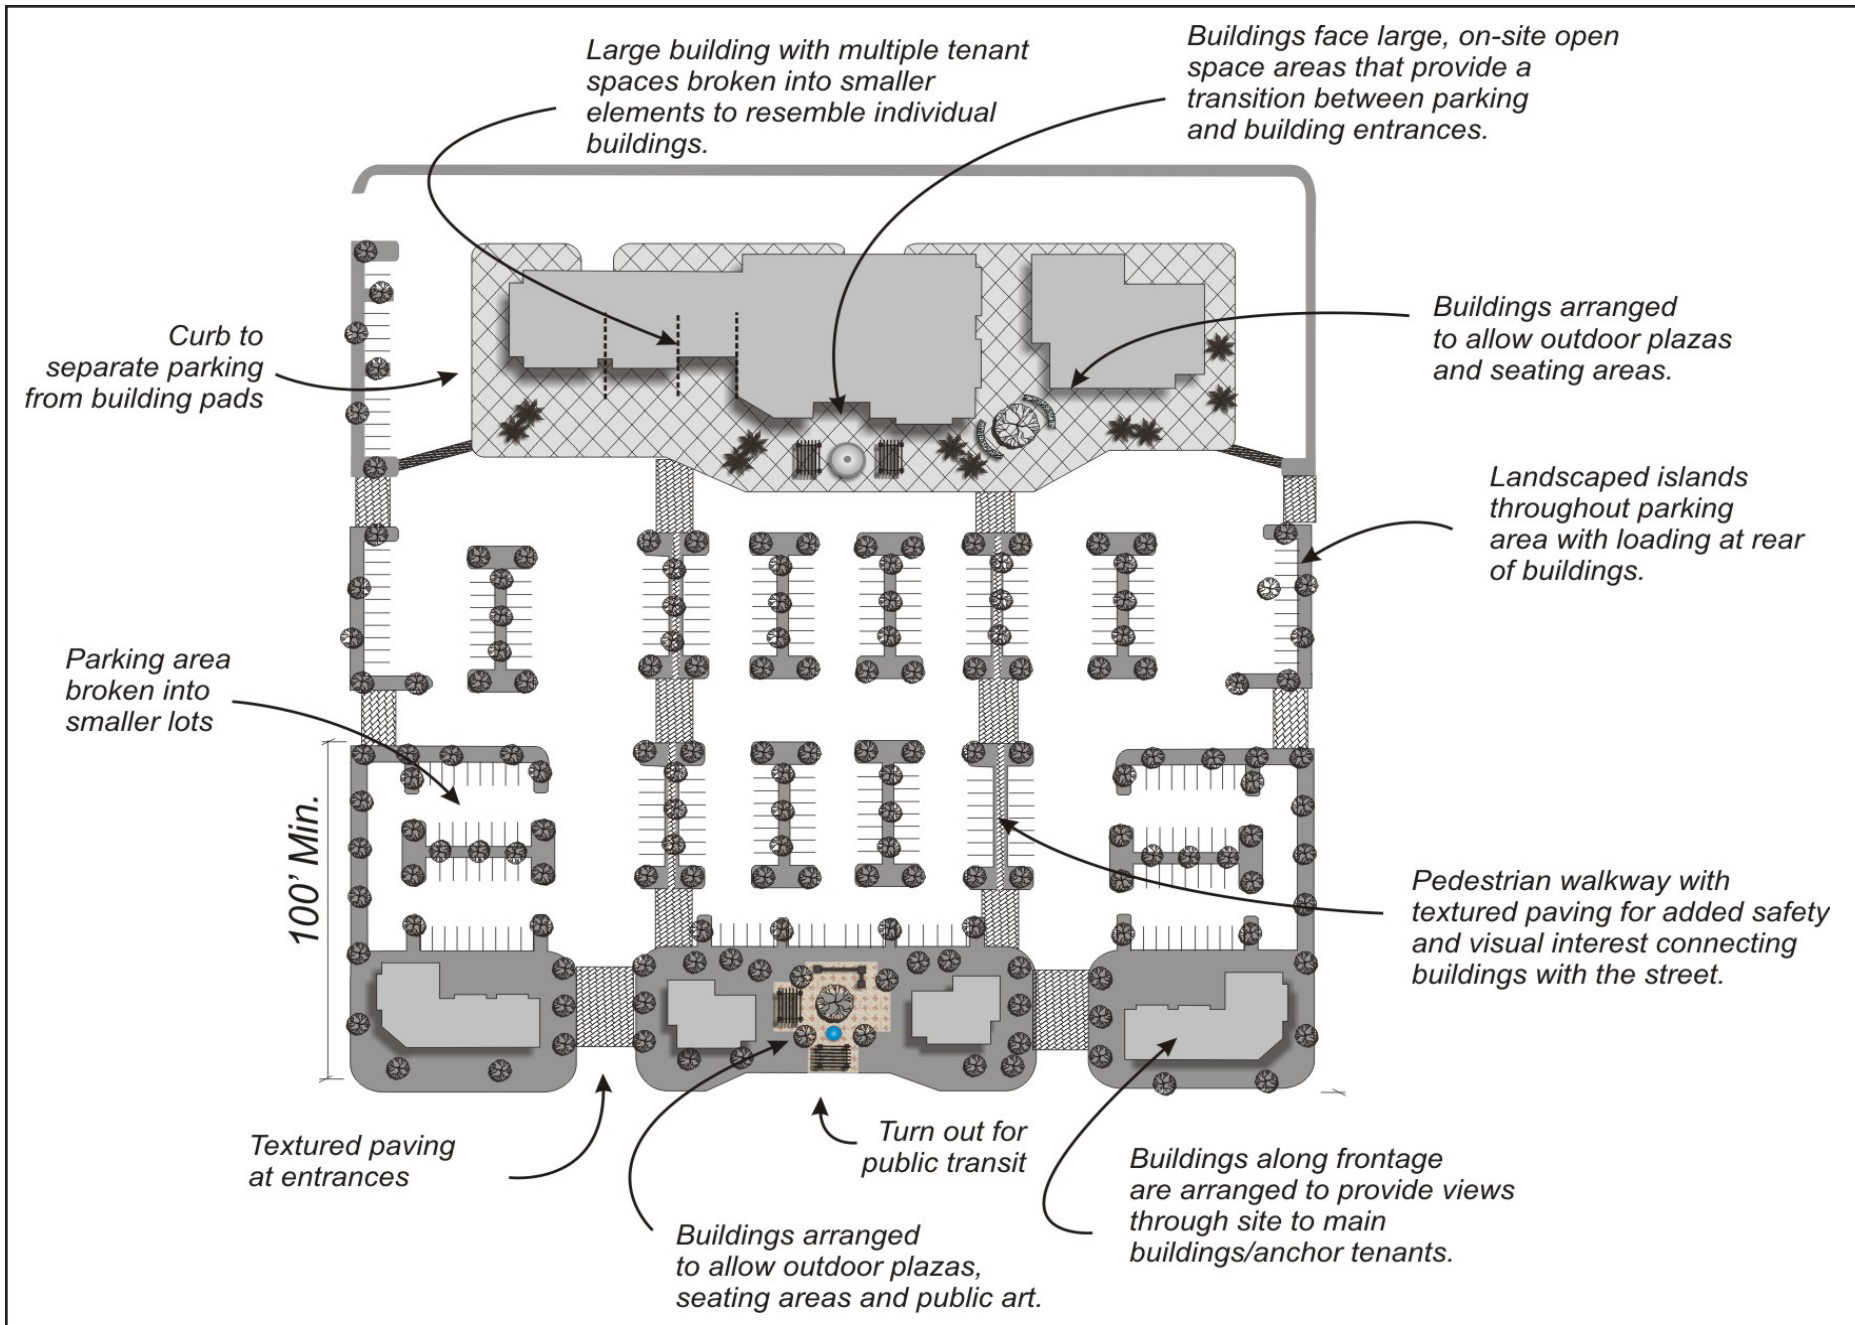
Large scale retail centers should facilitate pedestrian circulation
